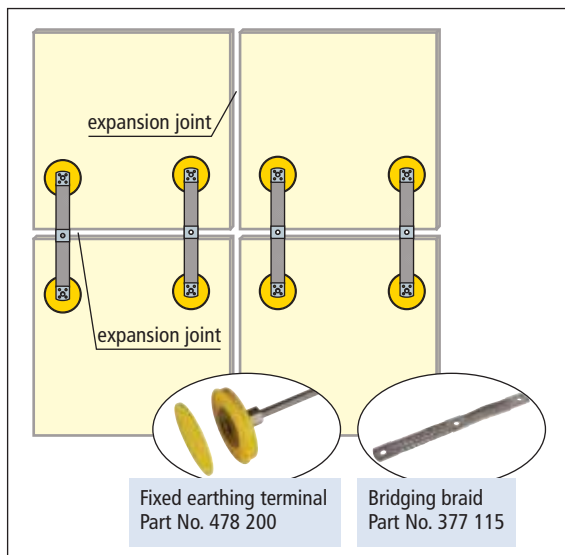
Use of natural components – new buildings made of ready-mix concrete
